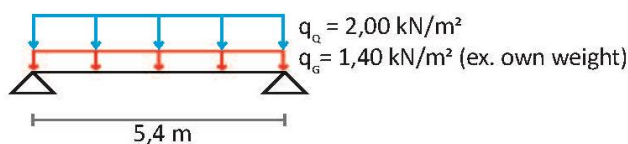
LOAD SCHEME LOAD GROUND FLOOR
